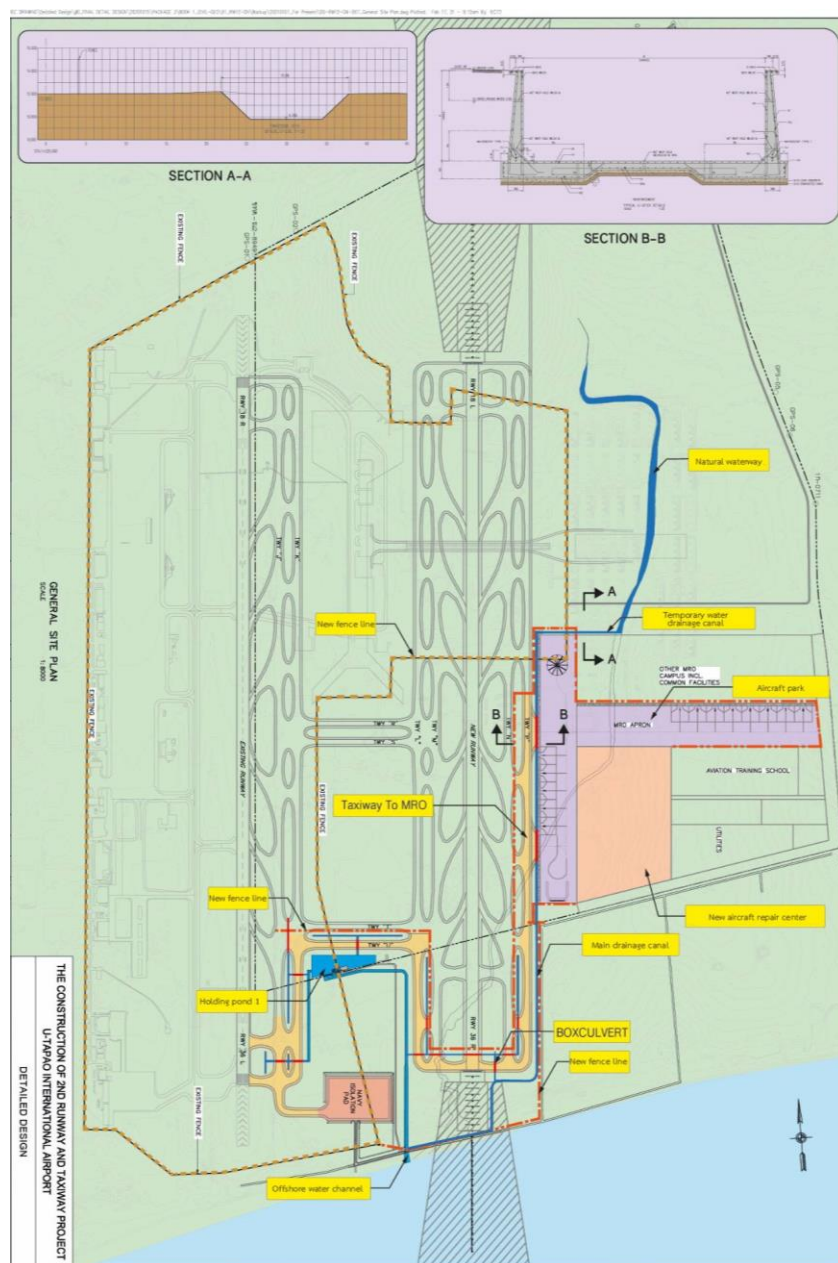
□3 Main drainage system after construction of the driveway connected to runway 1 to the new aircraft repair center(before construction of runway 2) is complete.
